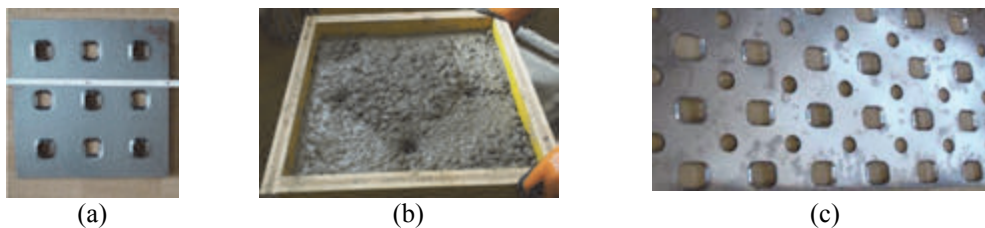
(a) Initial sheet specimen (750 x 750 mm), (b) sheet fixed in wooden mould during concreting procedure. (Apostolidi et al., 2014). (c) Steel sheet layout after preliminary numerical and experimental investigations (Rauch, 2014)
